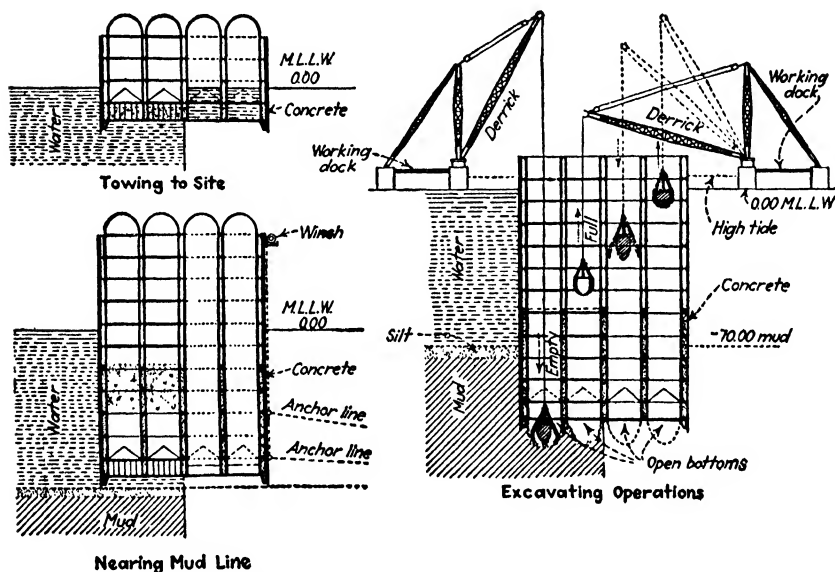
Sinking Compressed-air Flotation Caissons.
